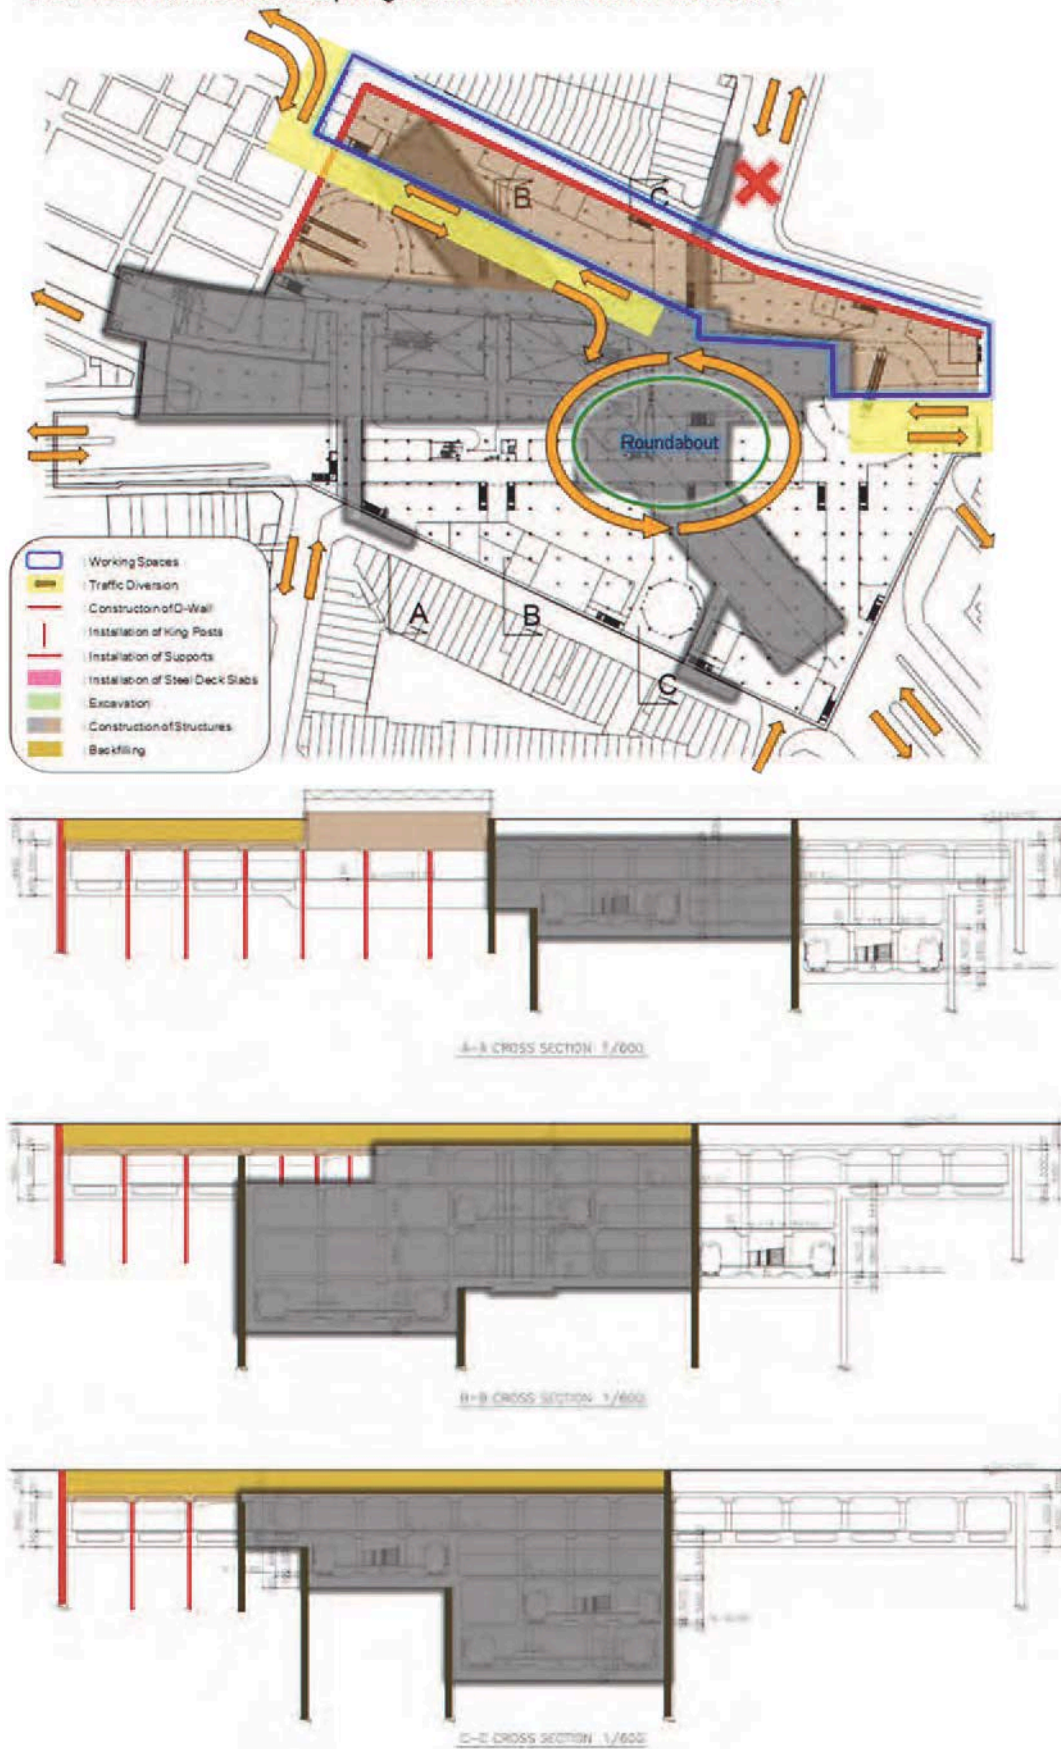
Construction Sequences of Ben Thanh Central Station (14/24)
